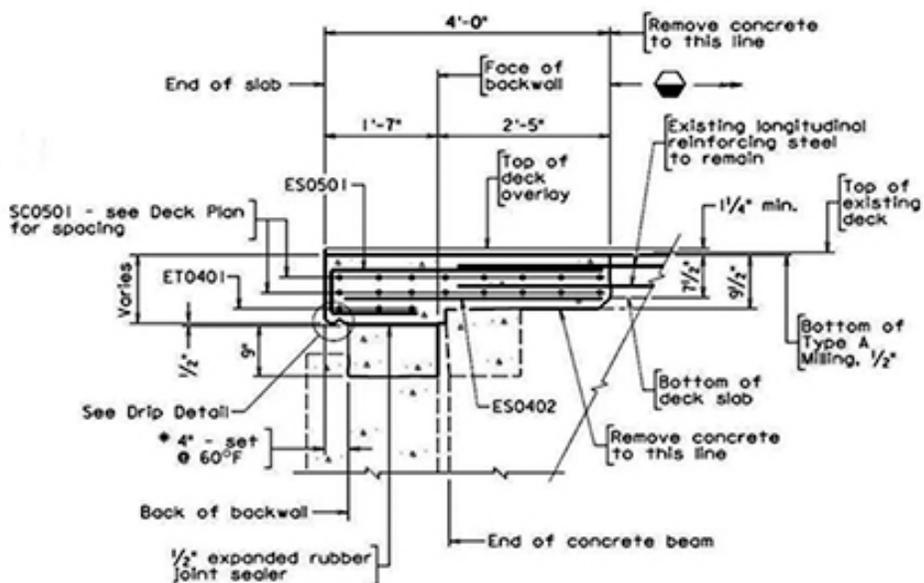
Detail for "Deck Extension" Eliminating Joint at Abutment
